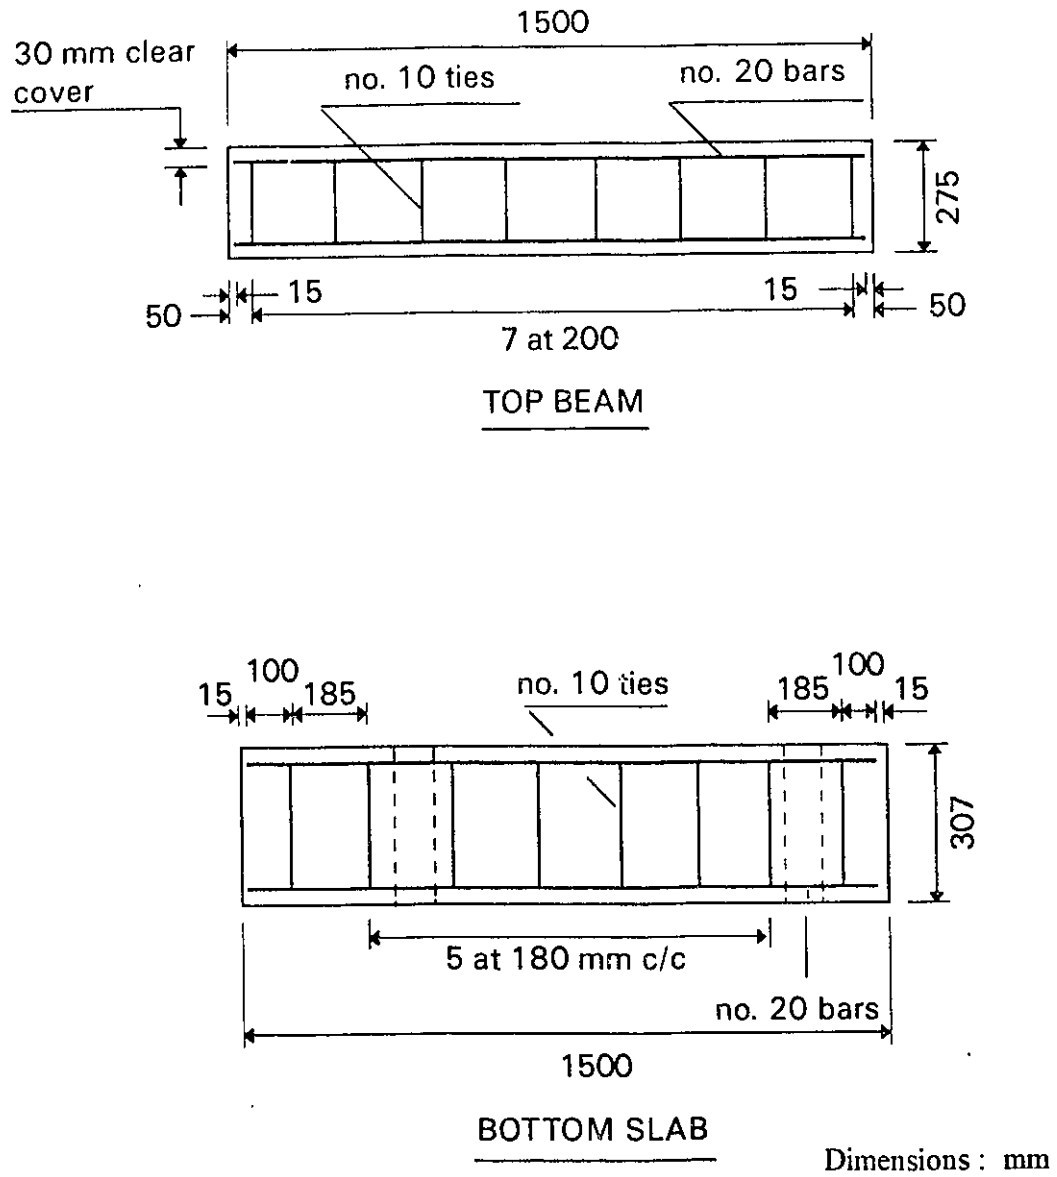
Sections of Top Beam (above) and Bottom Slab (below) of Wall 8
